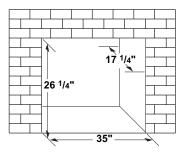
Rough Opening for Installing in Masonry Fireplace
